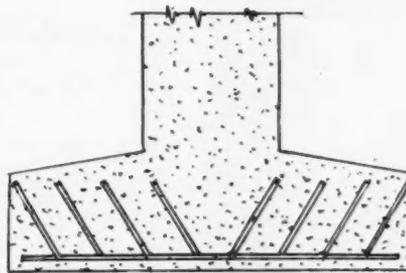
Reinforcing to Prevent Failure by Diagonal Tension. Use of Trussed Bar
